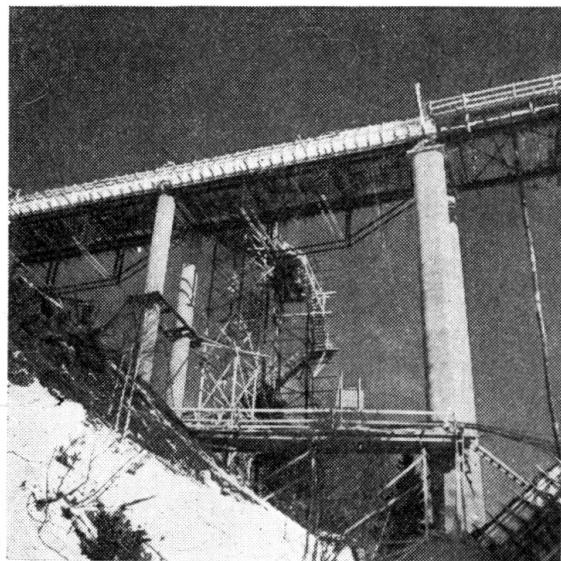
Steel trusses between columns, concreted by means of slide-forms. The hoist and tower at the concrete mixing plant is seen in the background
